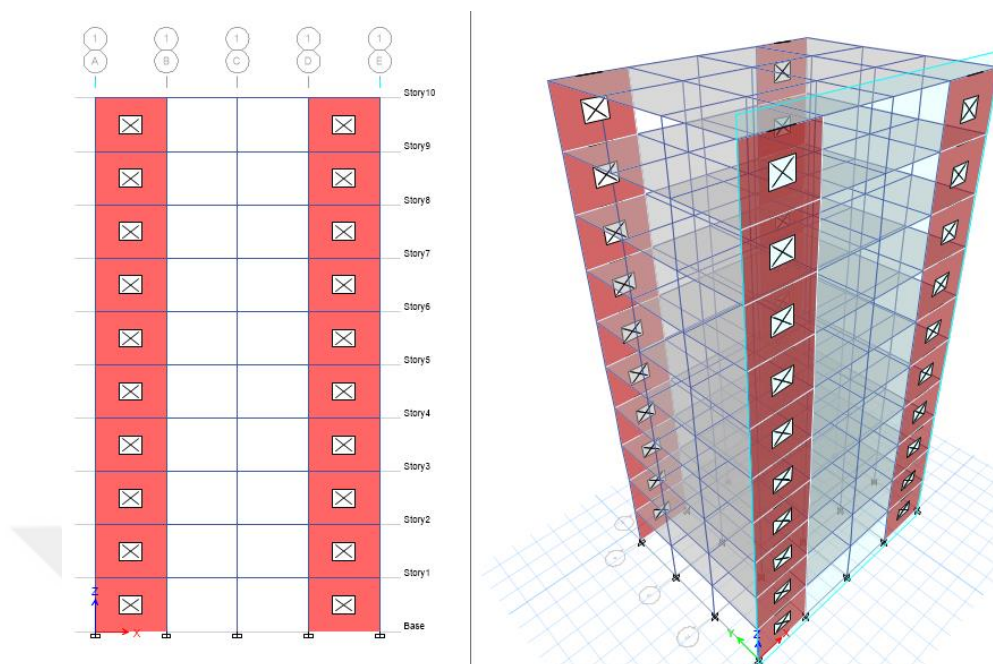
The 10-story building with concrete shear wall and with horizontal openings.
